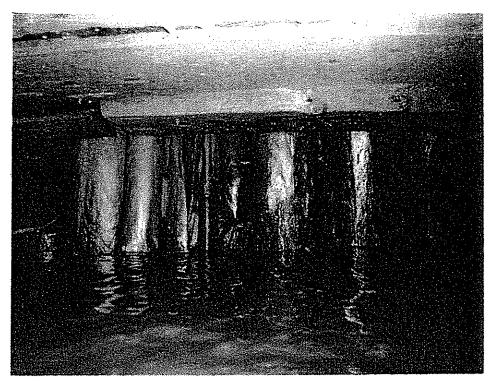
General view of deterioration in timber soldier pile bulkhead. Note gaps and rot in the timber piles.
